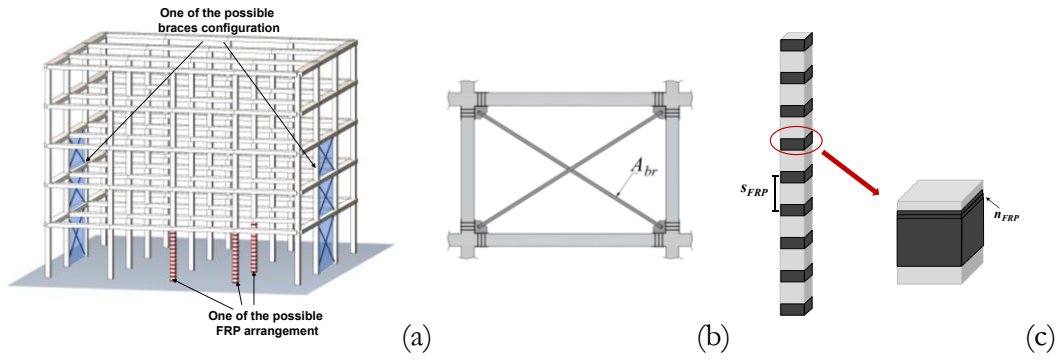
Representation of the design variables: (a) Generic FRP and bracing retrofitting configuration; (b) Typical arrangement of bracings; (c) Typical arrangement of CFRP
